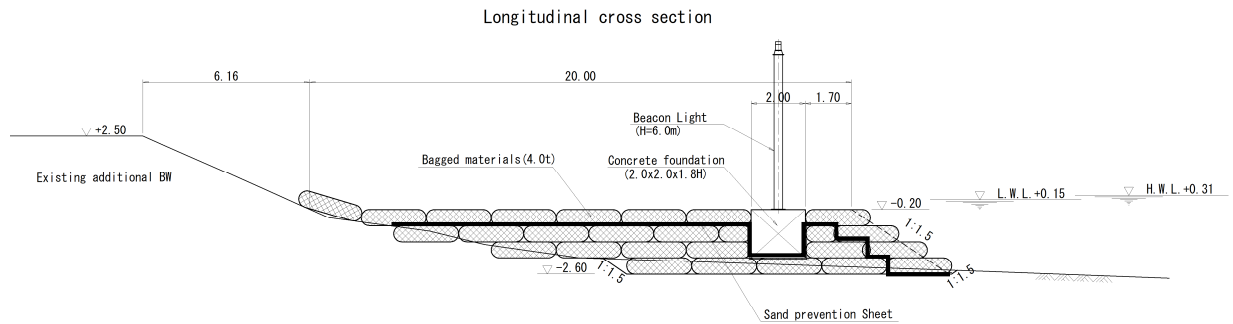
(2) Longitudinal cross section drawing of submerged breakwater (temporary)
